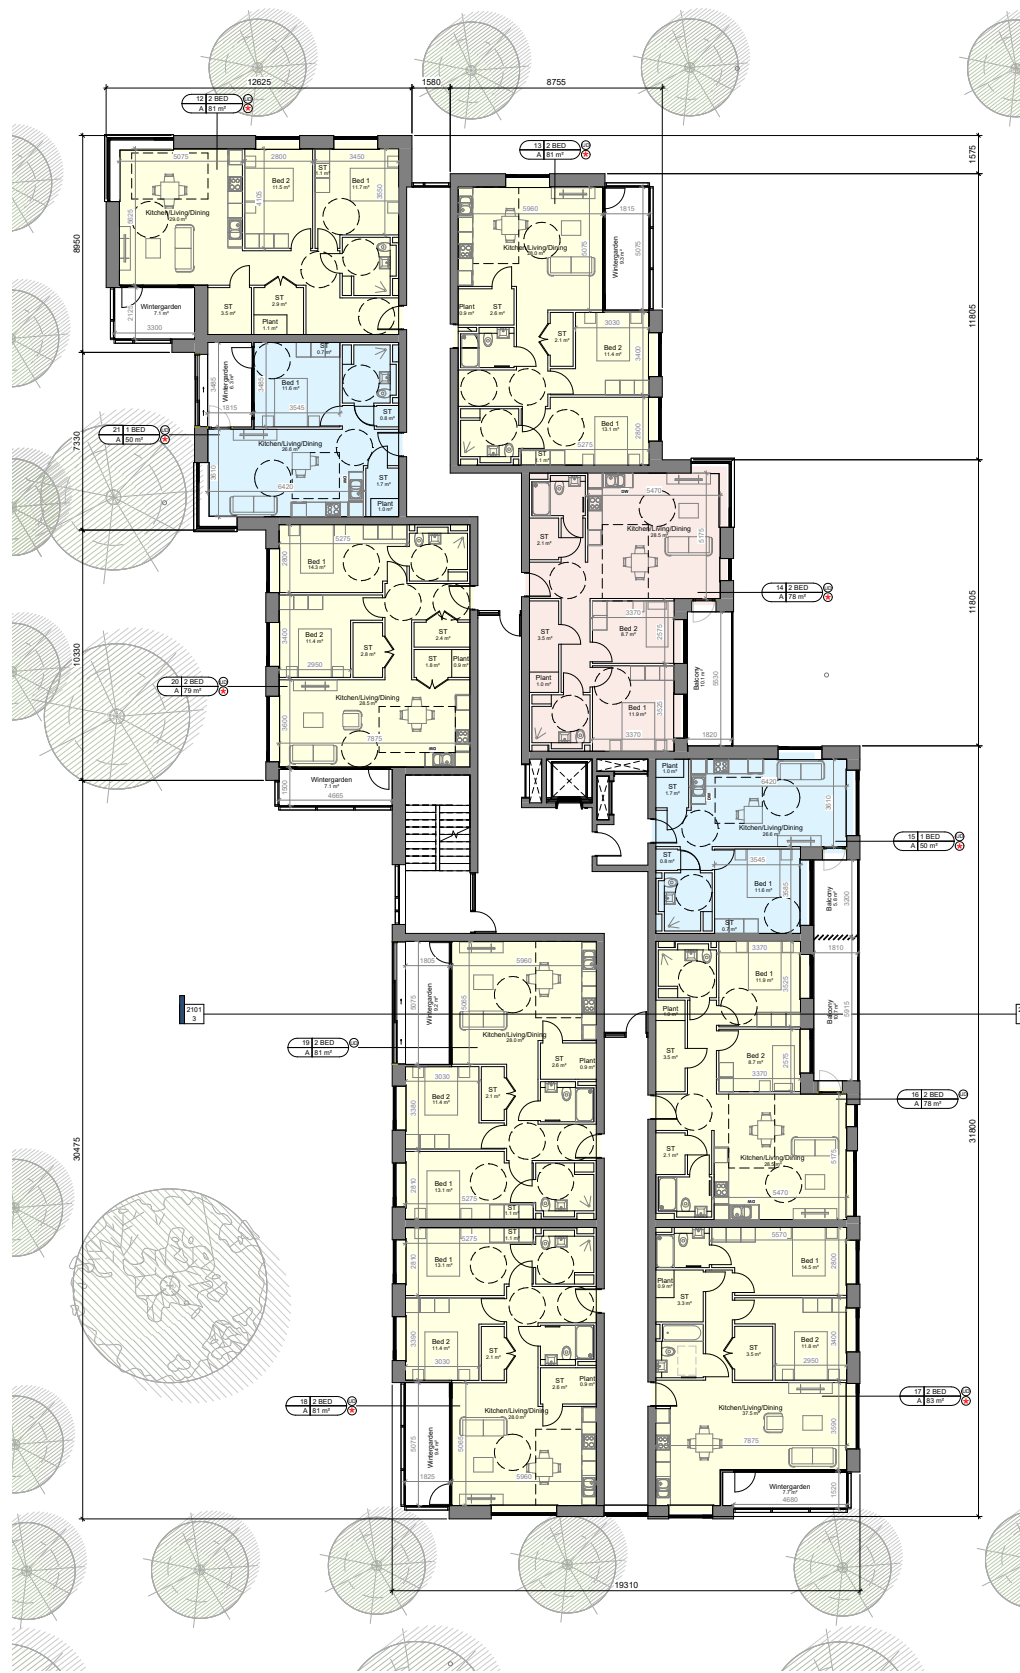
Block A - Second- Fifth Floor Plan Source: MCORM, 2026.
